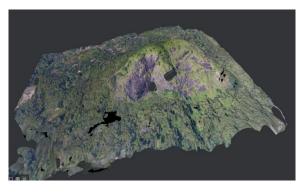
The 3D model shows that an extreme slope on hauling road alignment
